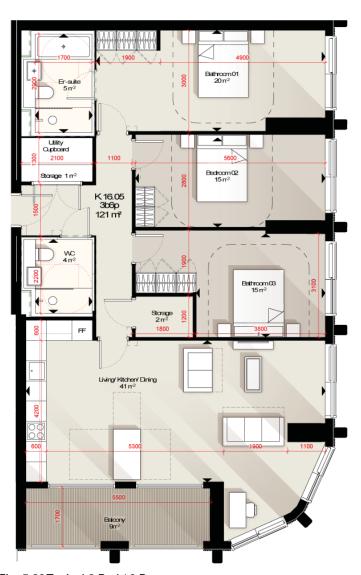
Typical 3 Bed / 6 Person apartment
